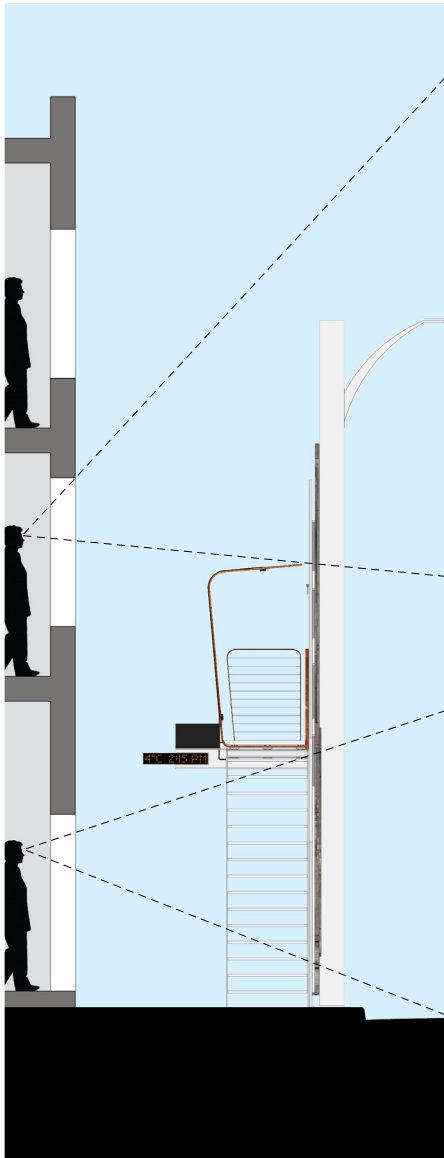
(left): section through building, sidewalk, and Light Post House illustrating height and view relationships
